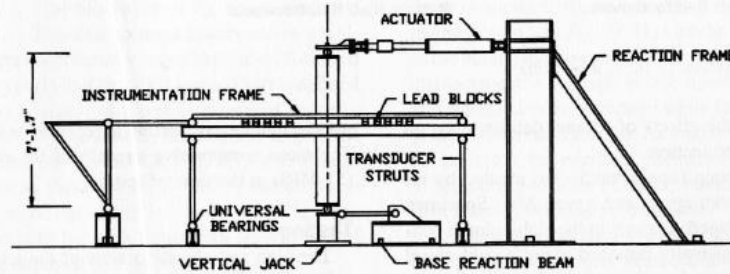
(b)—Test setup: elevation (1 in. = 25.4 mm)
